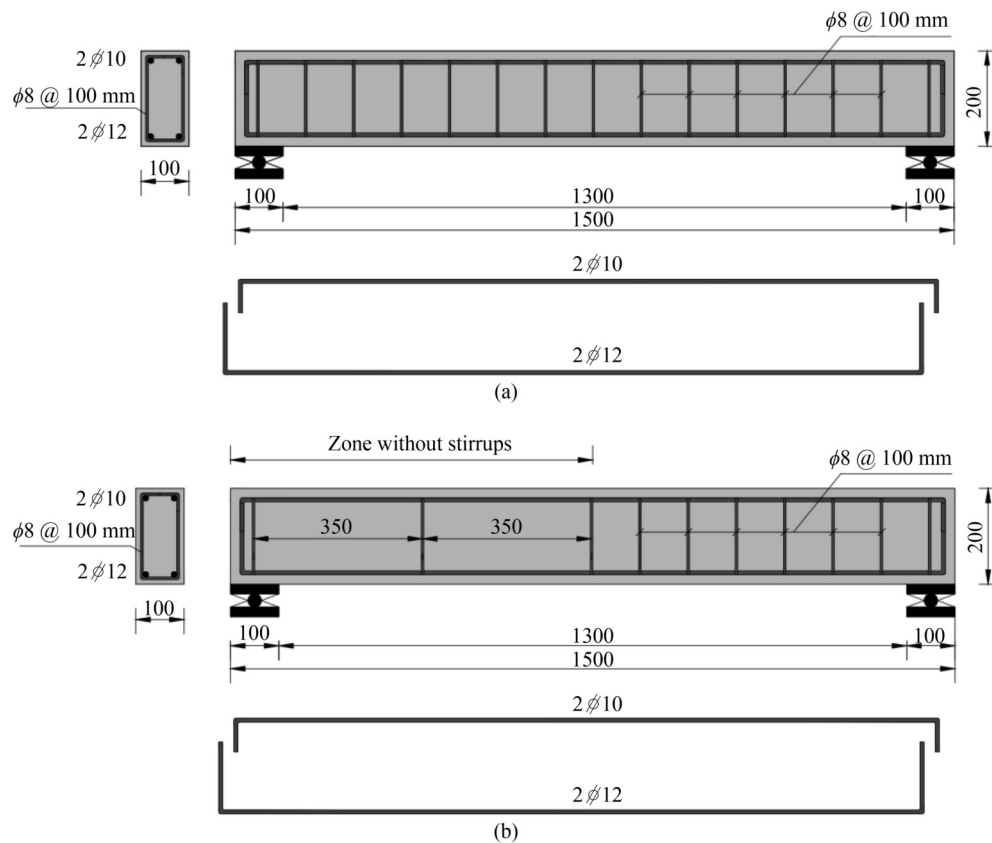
Schematic and details of tested beams (unit: mm): (a) control beam; (b) non-stirrup beam.
